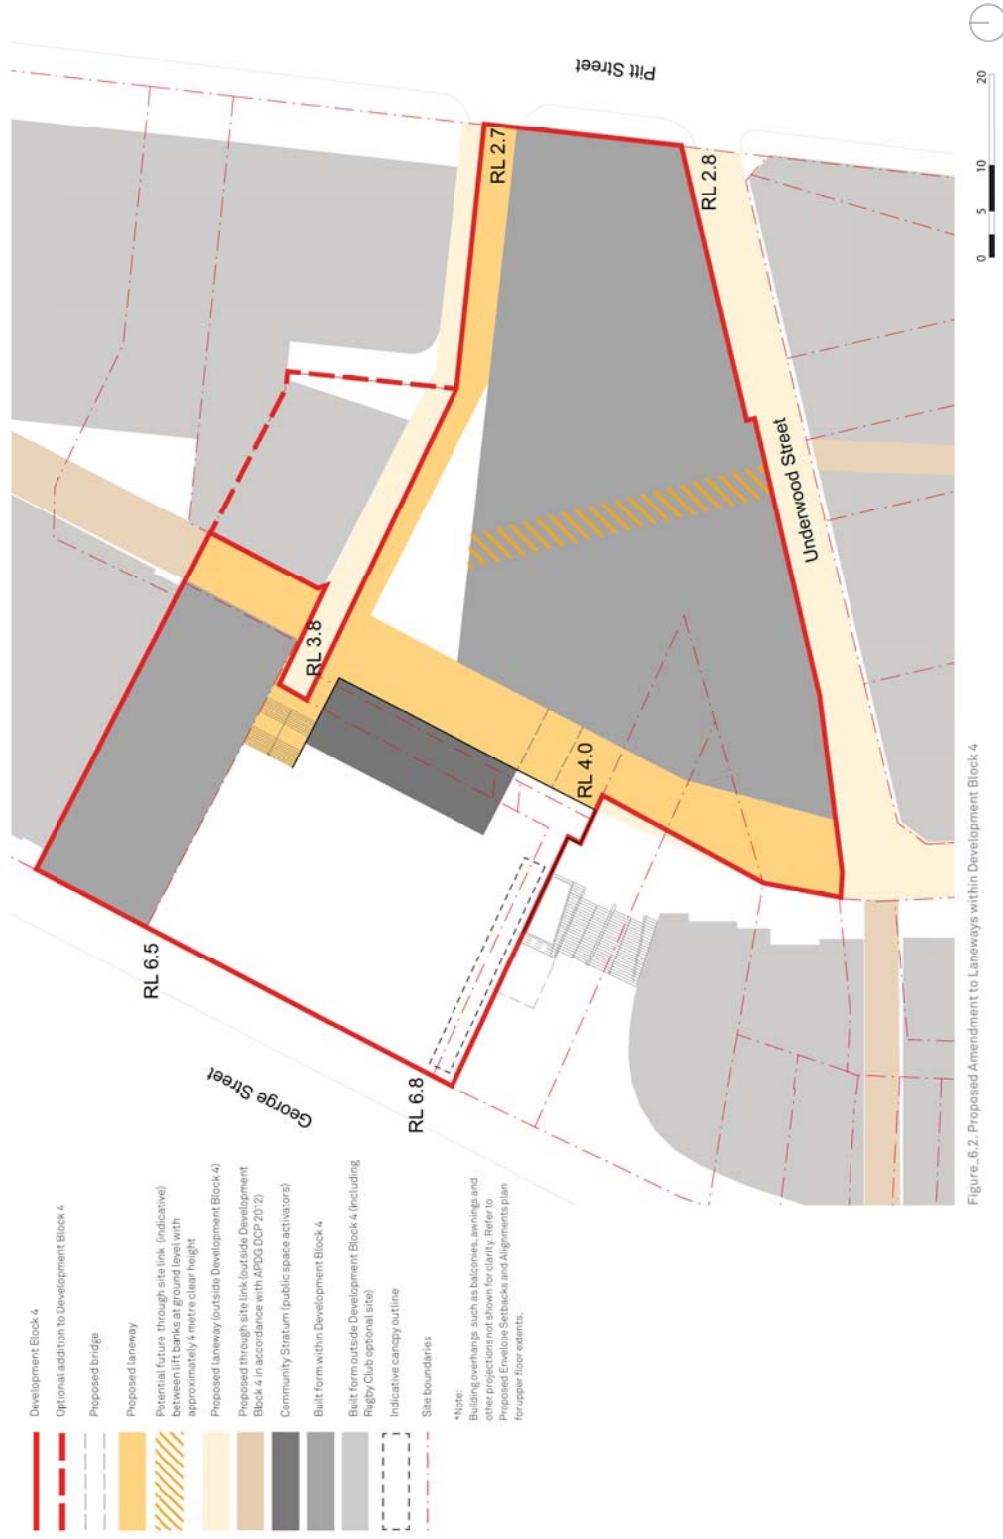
Proposed Amendment to Laneways within Development Block 4
